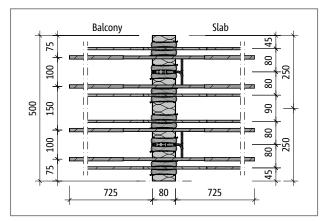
Schöck Isokorb® T type K-E-M6: Product layout of the variant length L500
